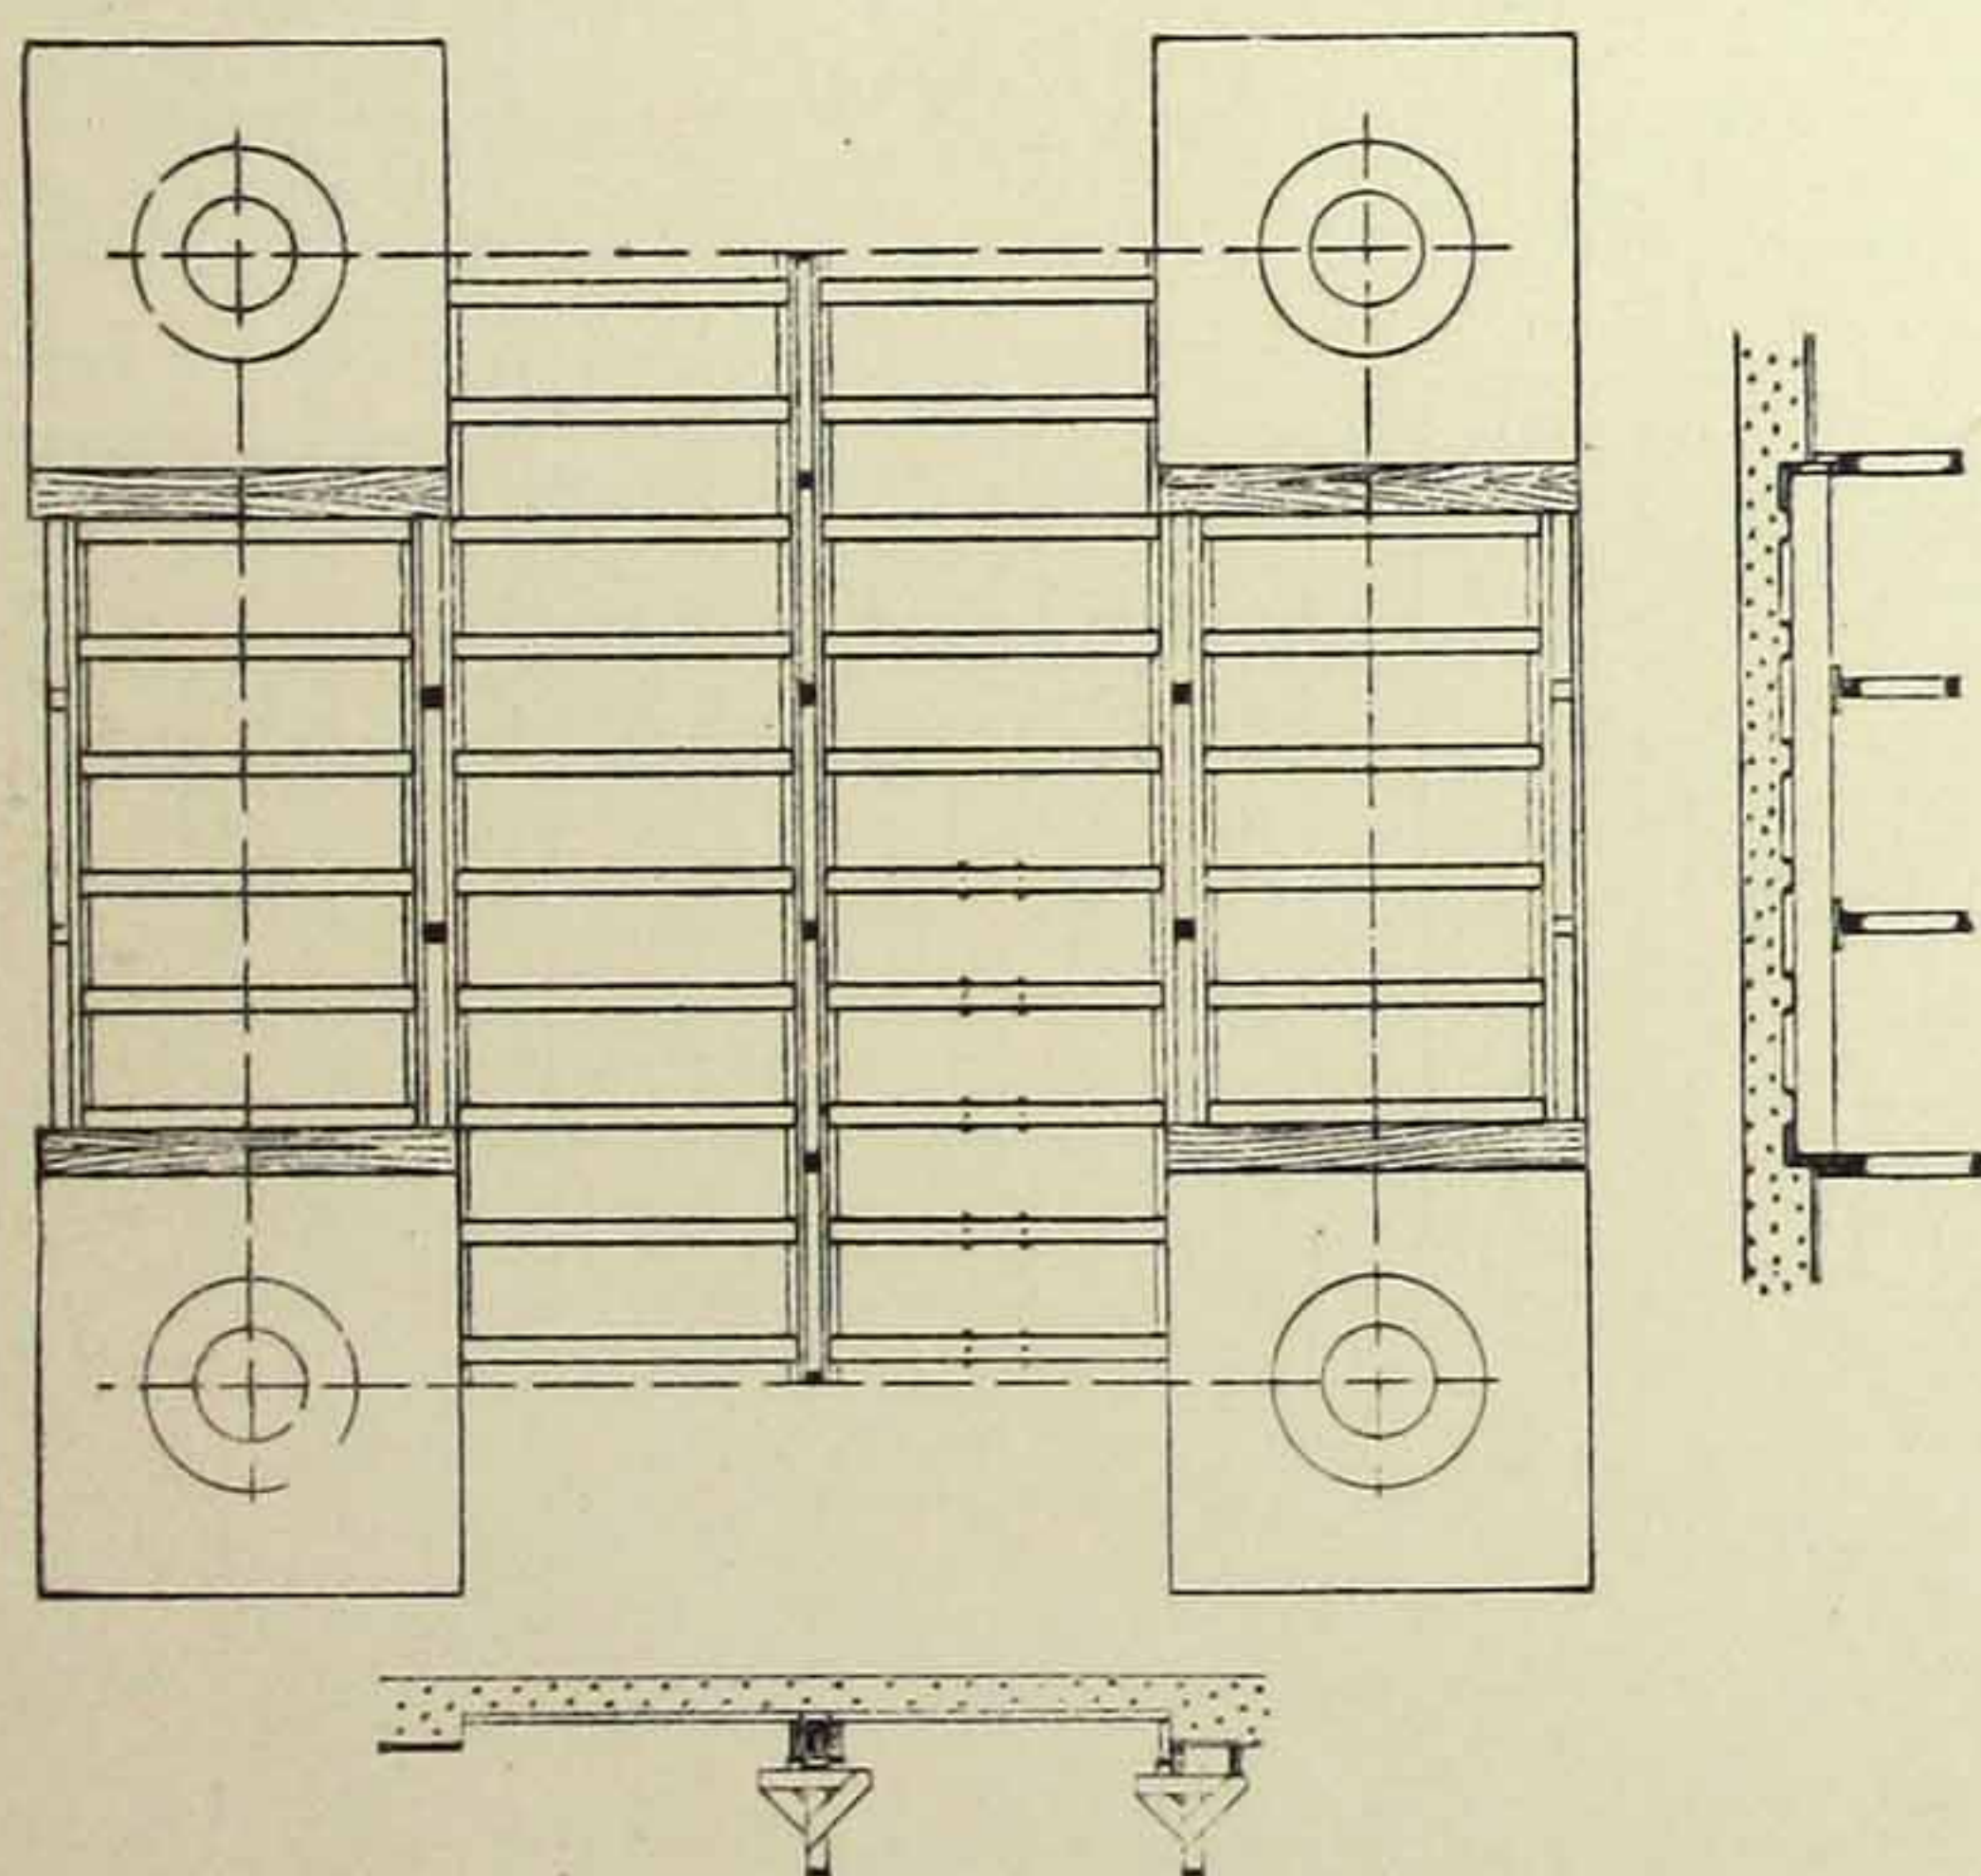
SPACING OF POSTS FOR SLAB CONSTRUCTION
